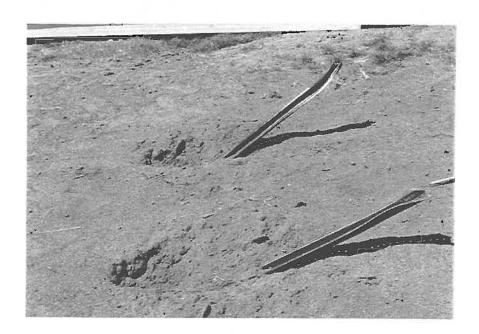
Dual 2-1/2 lb steel U-channel support installation anchored in weak soil after test 405231-13.
